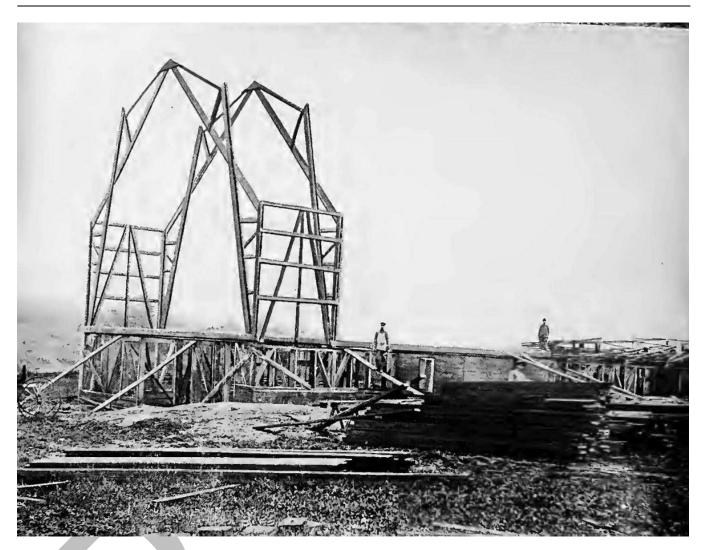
Image of a Wisconsin-style barn being erected and showing the plank frame construction and Shawver truss system. ¹¹
